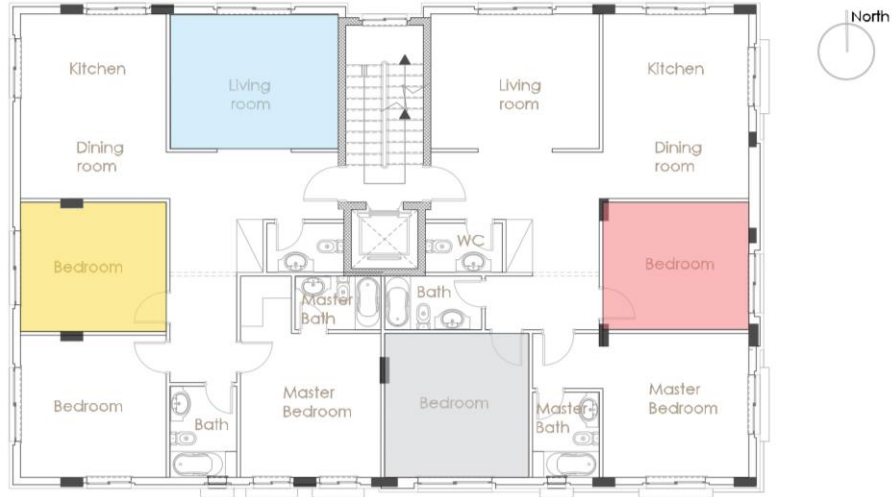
The building plan showing the analyzed spaces toward different orientations
